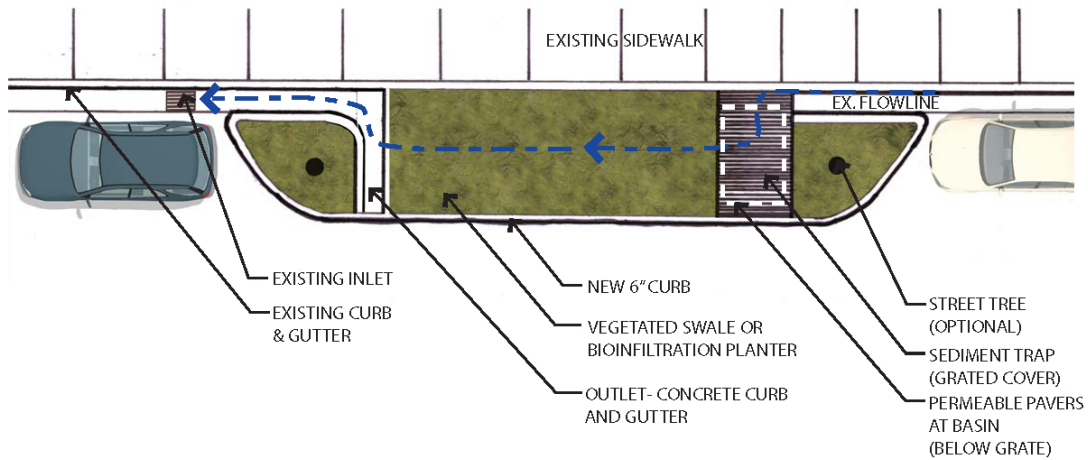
In-street Sediment Trap Conceptual Design Sketch- Plan and Section- Urban/ Commercial Street Application
